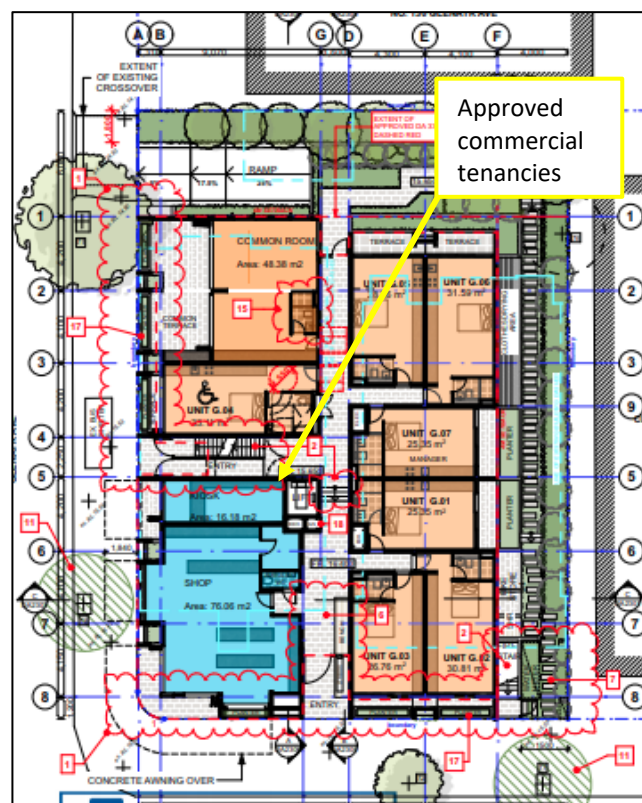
Ground floor plan of approved mixed development (Source: Mark Shapiro Design)
